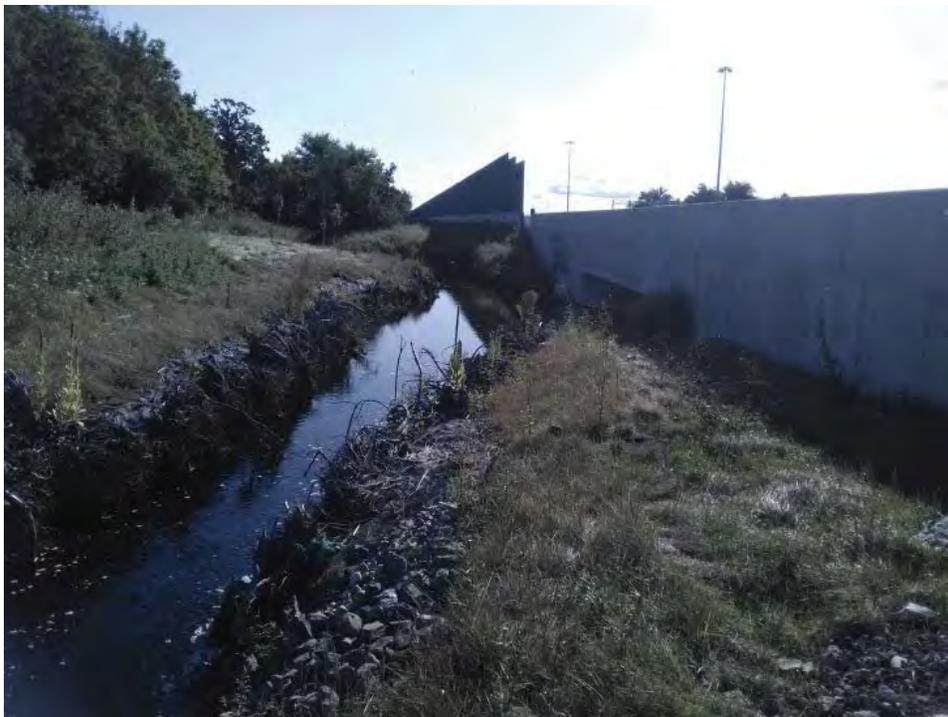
Looking upstream (north) from 60 meters north of Corkstown Road
